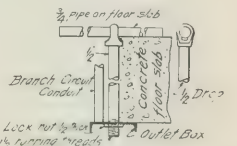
DETAIL OF CEILING OUTLET AND LIGHTING-FIXTURE SUPPORT
